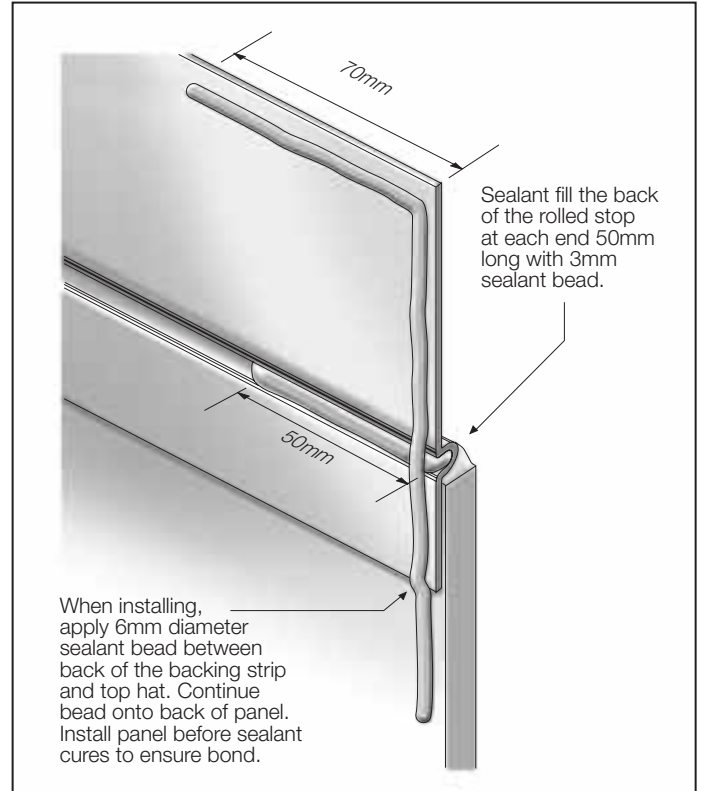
SEALING EXOTEC BACKING STRIP END DETAIL
